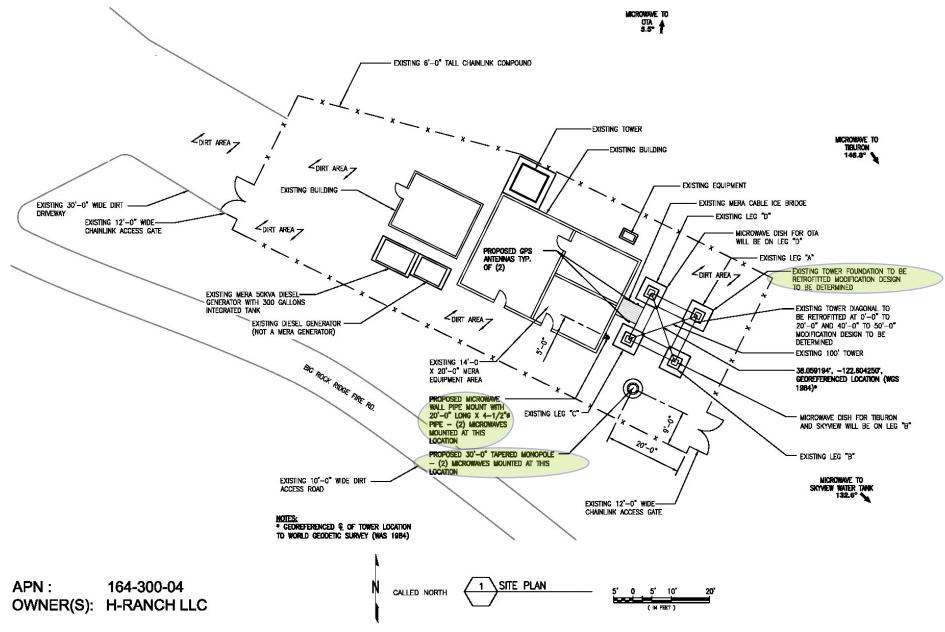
Site 3 - Big Rock Ridge Site Plan
